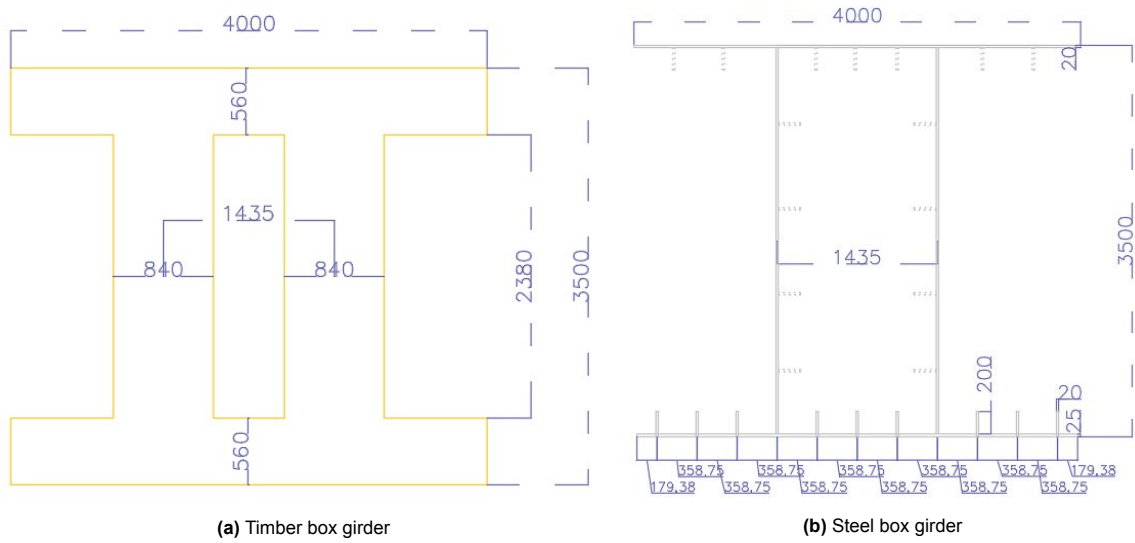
Timber and steel boxgirder of current design with a height of 3.5 m. The steel section has stiffeners that have not been calculated but will be constructed in the final cross-section design and are included in the weight calculation.
